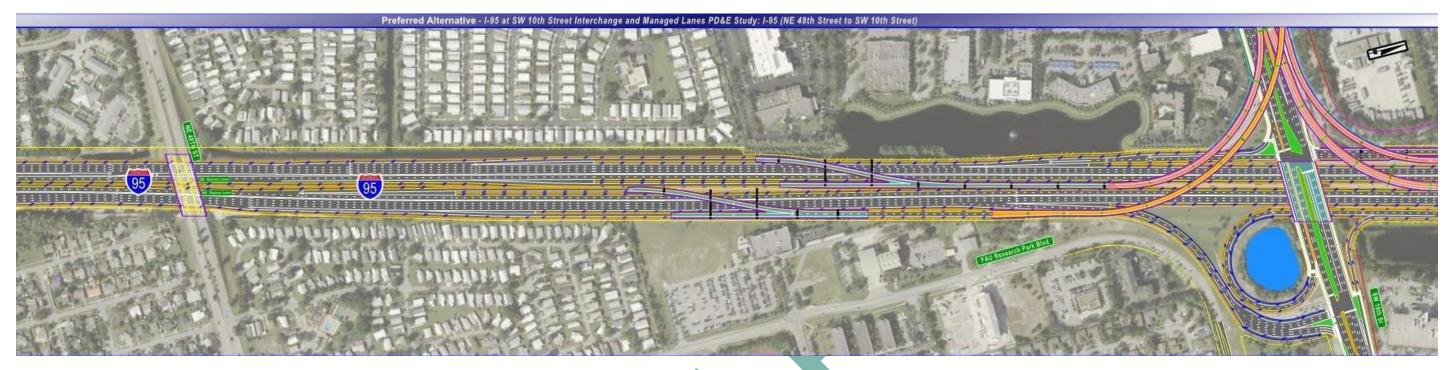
I-95 – Preferred Alternative Concept Plan (S of SW 10 St)
